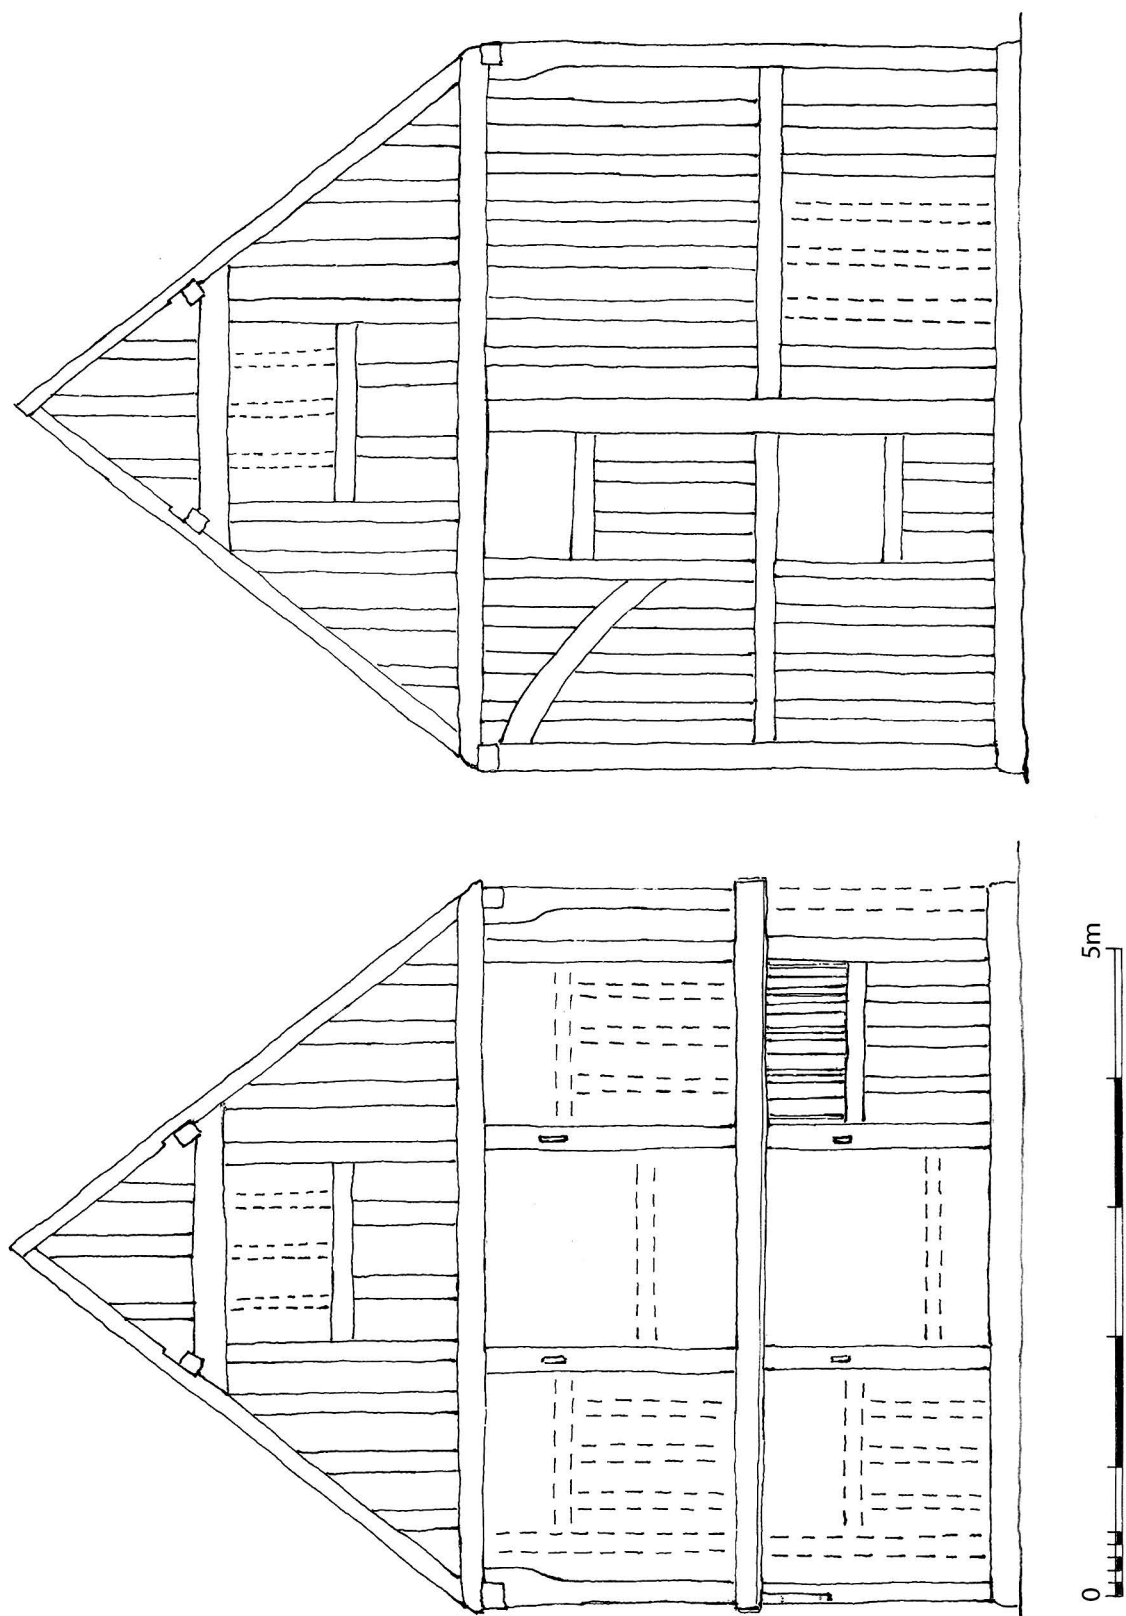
Bullocks Cross, south (left) and north (right) elevations
